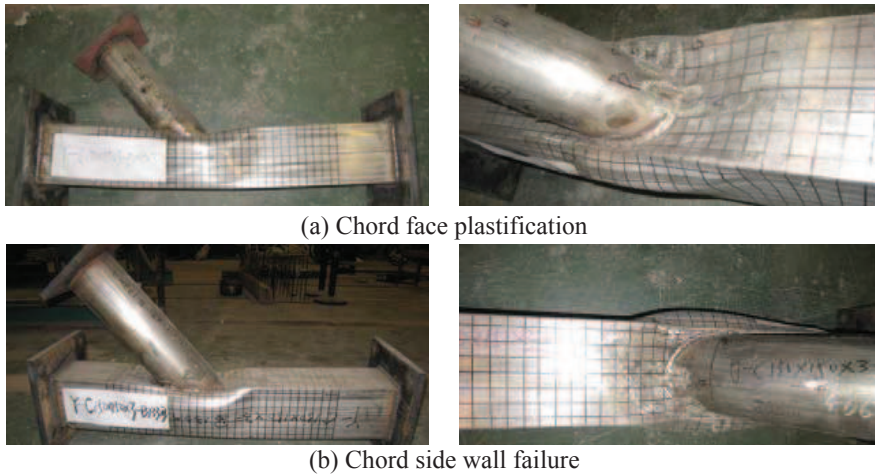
Typical failure modes of stainless steel tubular Y-joints
